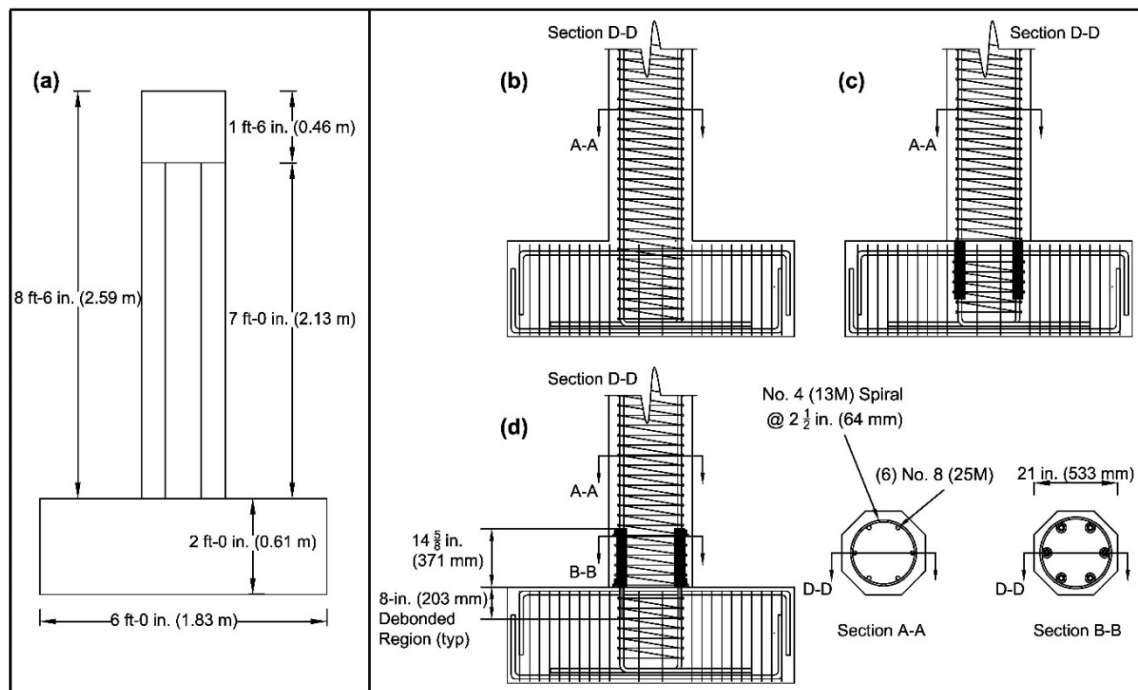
Details of specimens: (a) Subassembly dimensions, (b) CIP, (c) Precast-1, and (d) Precast-2.
